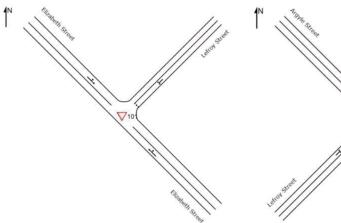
Geometric layout – Elizabeth Street / Lefroy Street intersection
